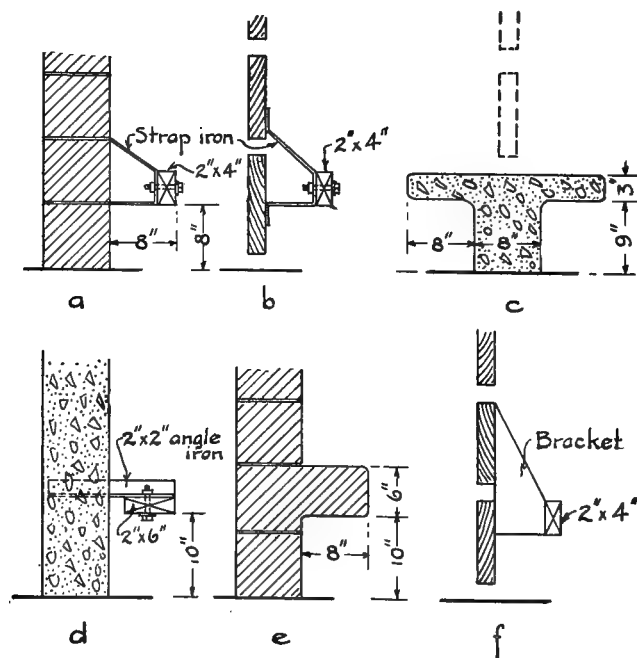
Several Types of Fenders or Guard Rails suggested for use in concrete hog houses.
